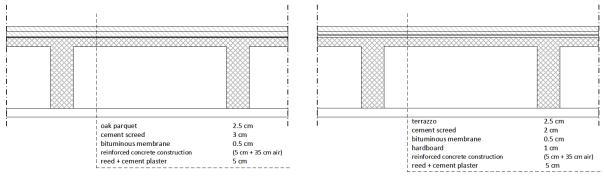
Floors/Ceilings across the Faculty building (FC1, FC2).
